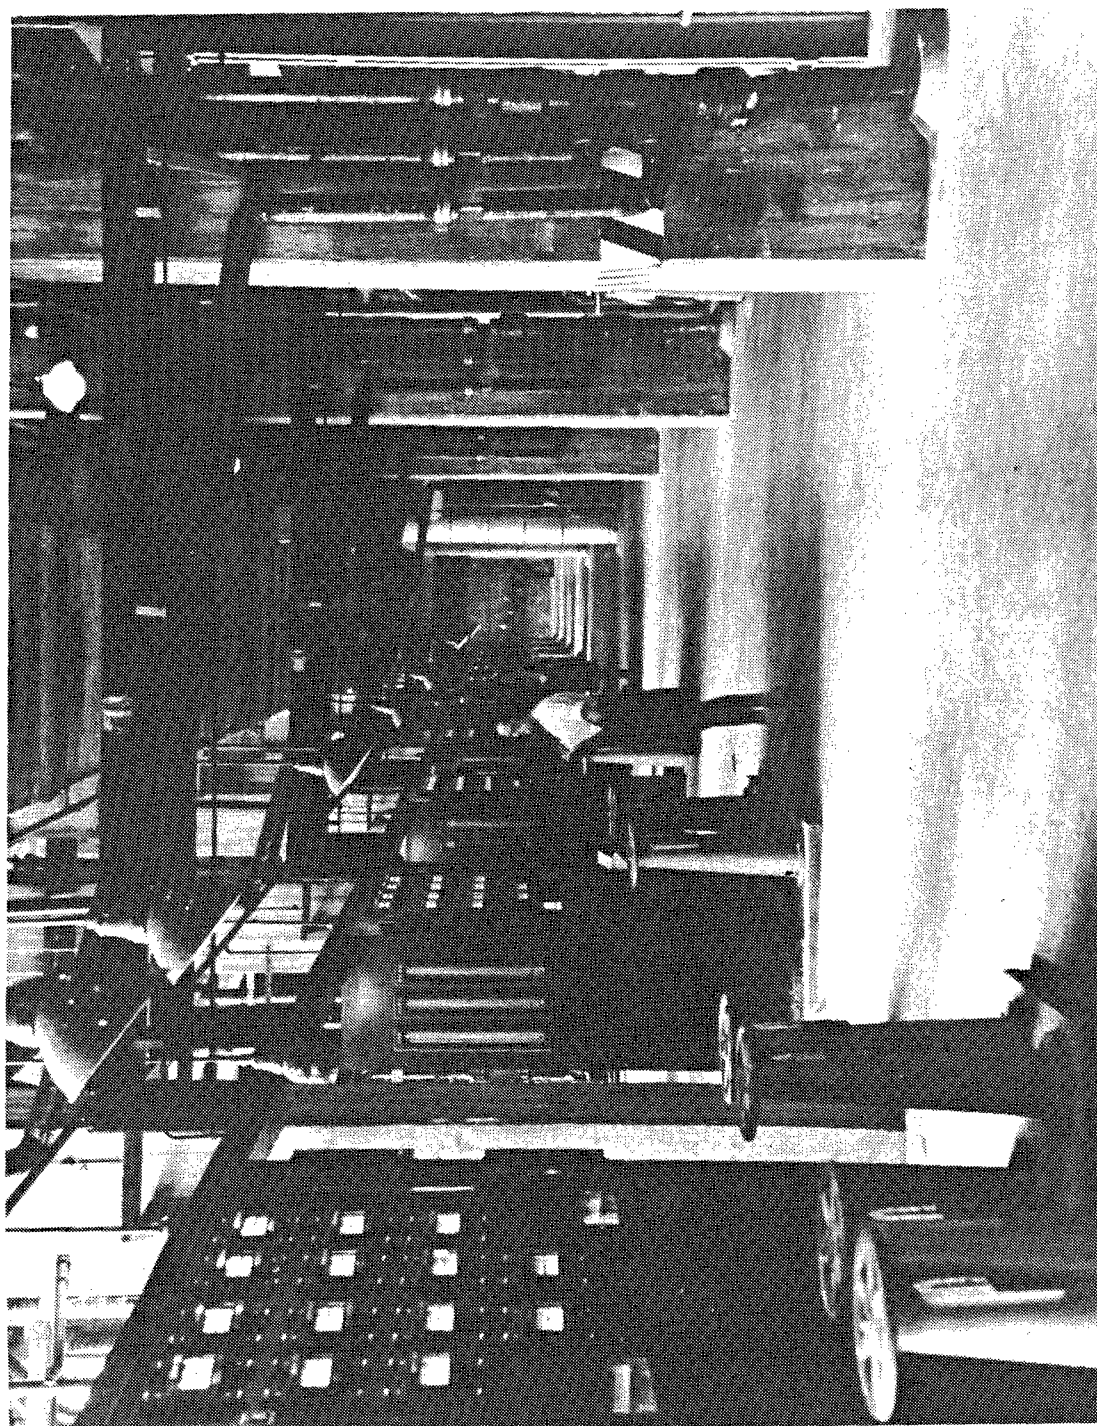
Interior, Building 7, Area A (courtesy of Holston AAP Photo Set No. 7 [on file Engineering Vault, Building 26]).
